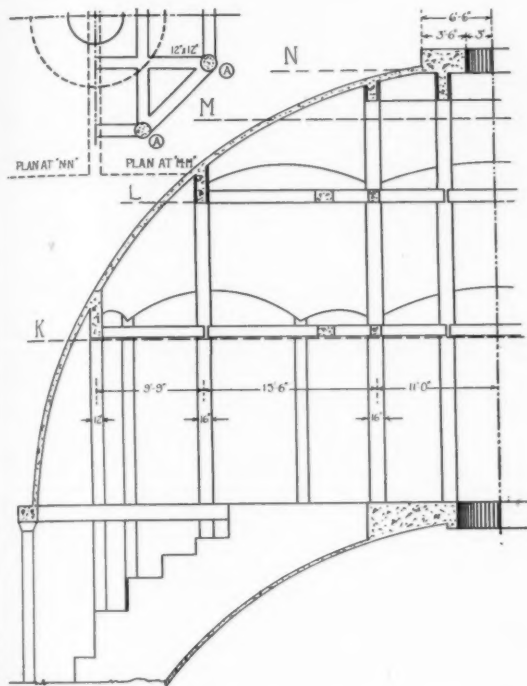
Section through the outer dome showing the frame work supporting it and plans at levels M and N. See Fig. 9 for plans at levels K and L. At M on key drawing, Fig. 1.
